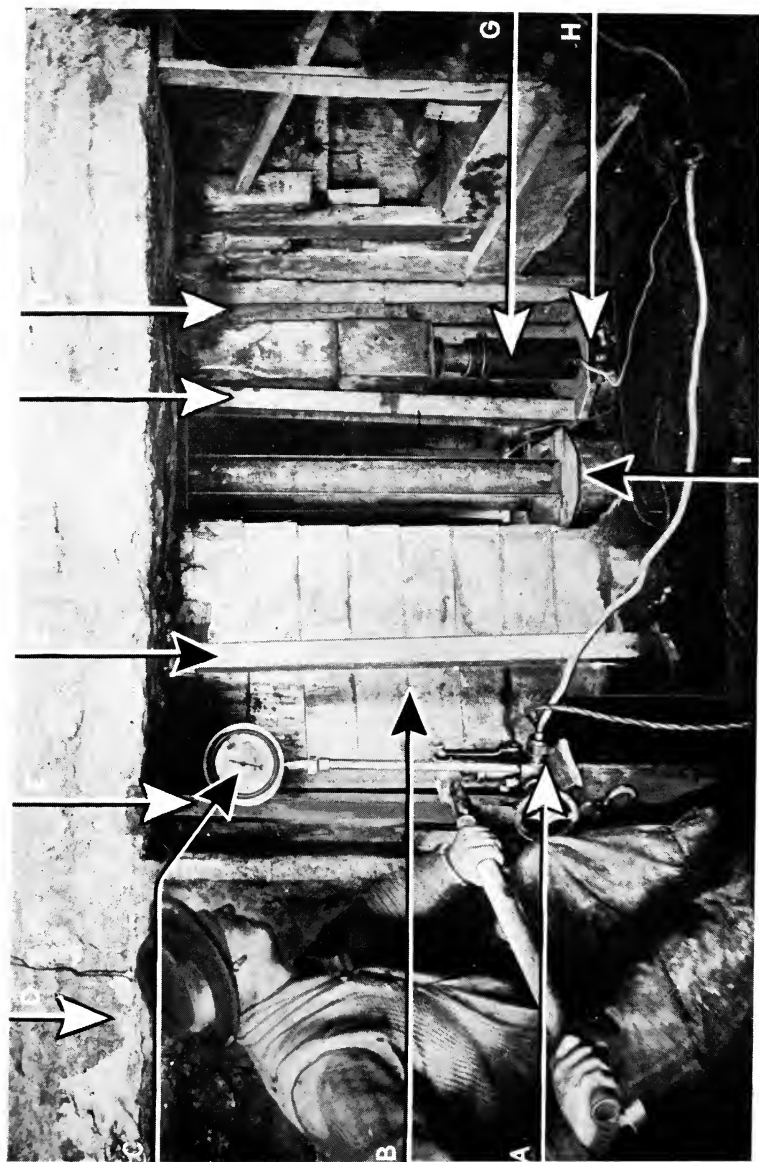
Improved Method of Loading Piles Beneath Building Foundations, Patents Pending
